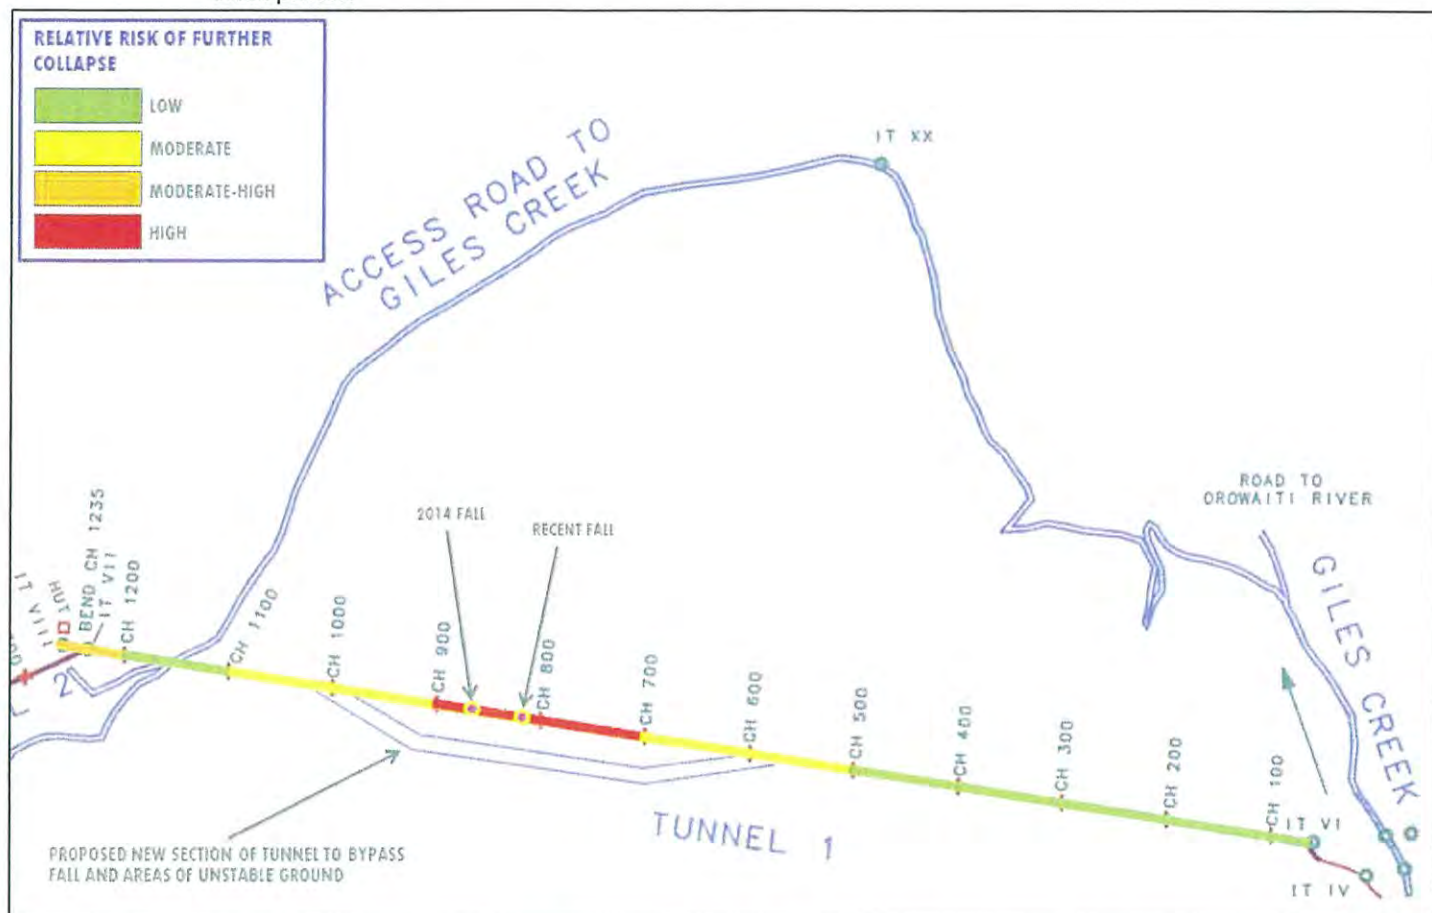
Plan showing relative geotechnical risk and proposed bypass of fall and areas of high instability
